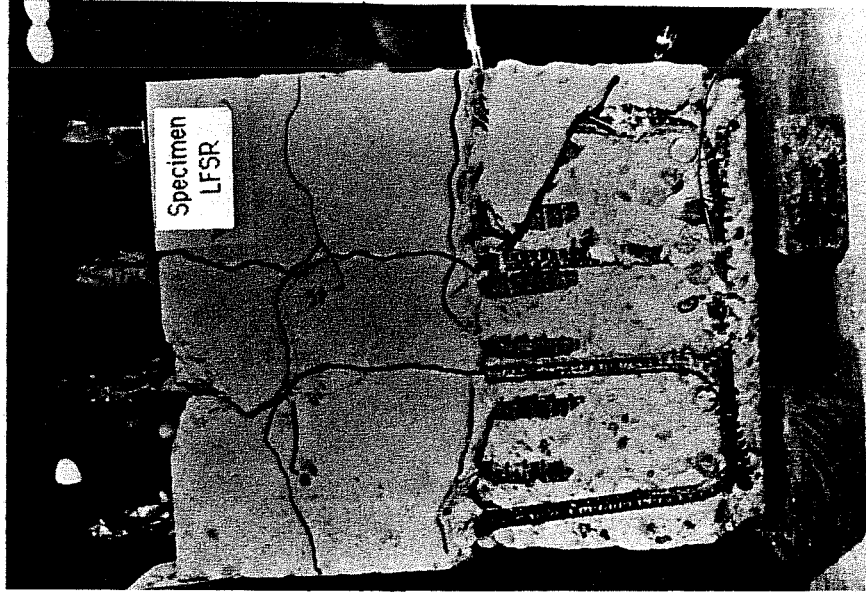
Specimen LFSR-Development Failure of Transverse Reinforcement (North and Top Faces)
